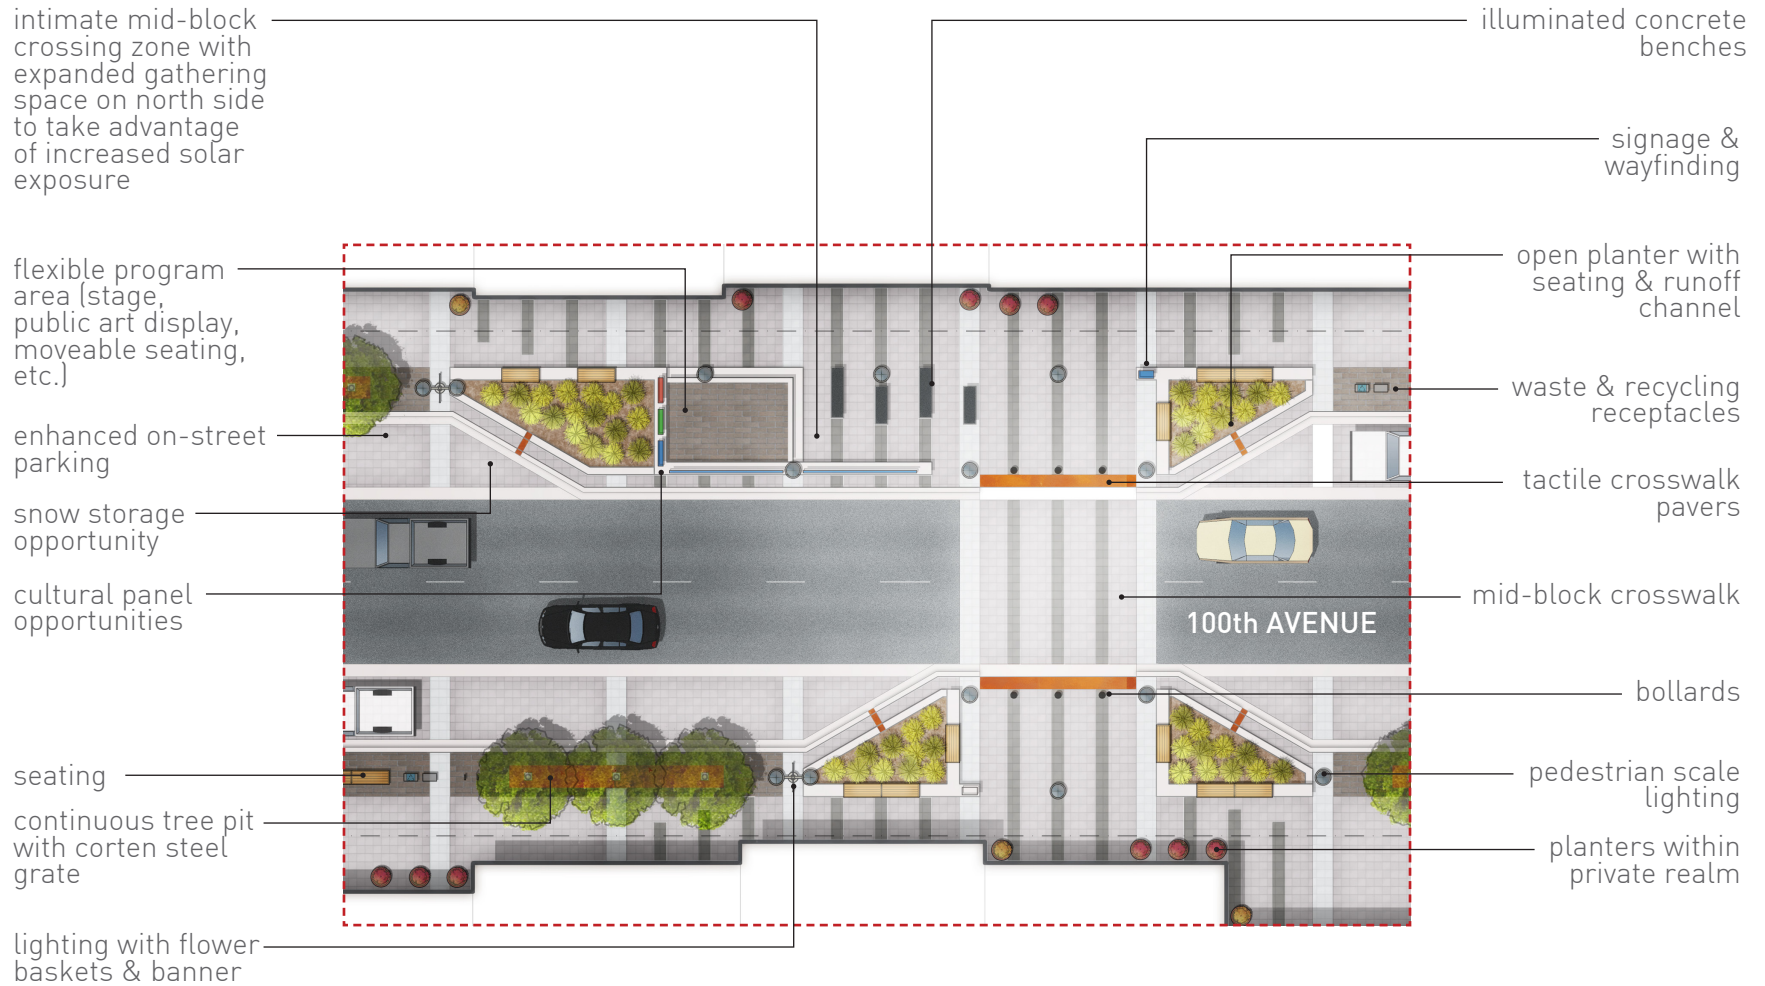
Urban Avenue (100th Avenue) Mid-Block Crossing Demonstration Plan
